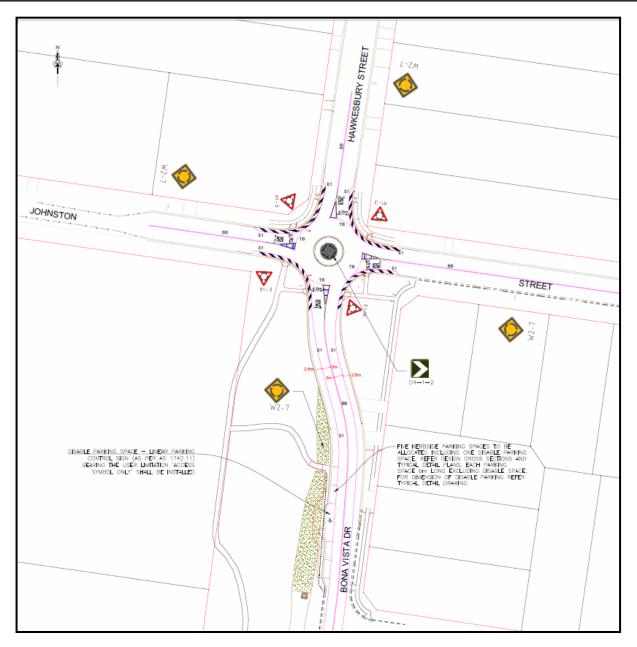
Proposed Intersection Layout for Johnston Street - Hawkesbury Street - Bona Vista Drive
